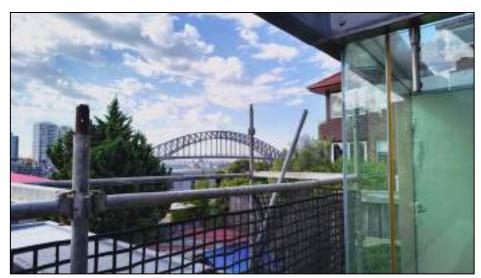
View from bedroom terrace of No. 17 King George Street at 2.2m from FFL – notably a higher degree of downward angle
